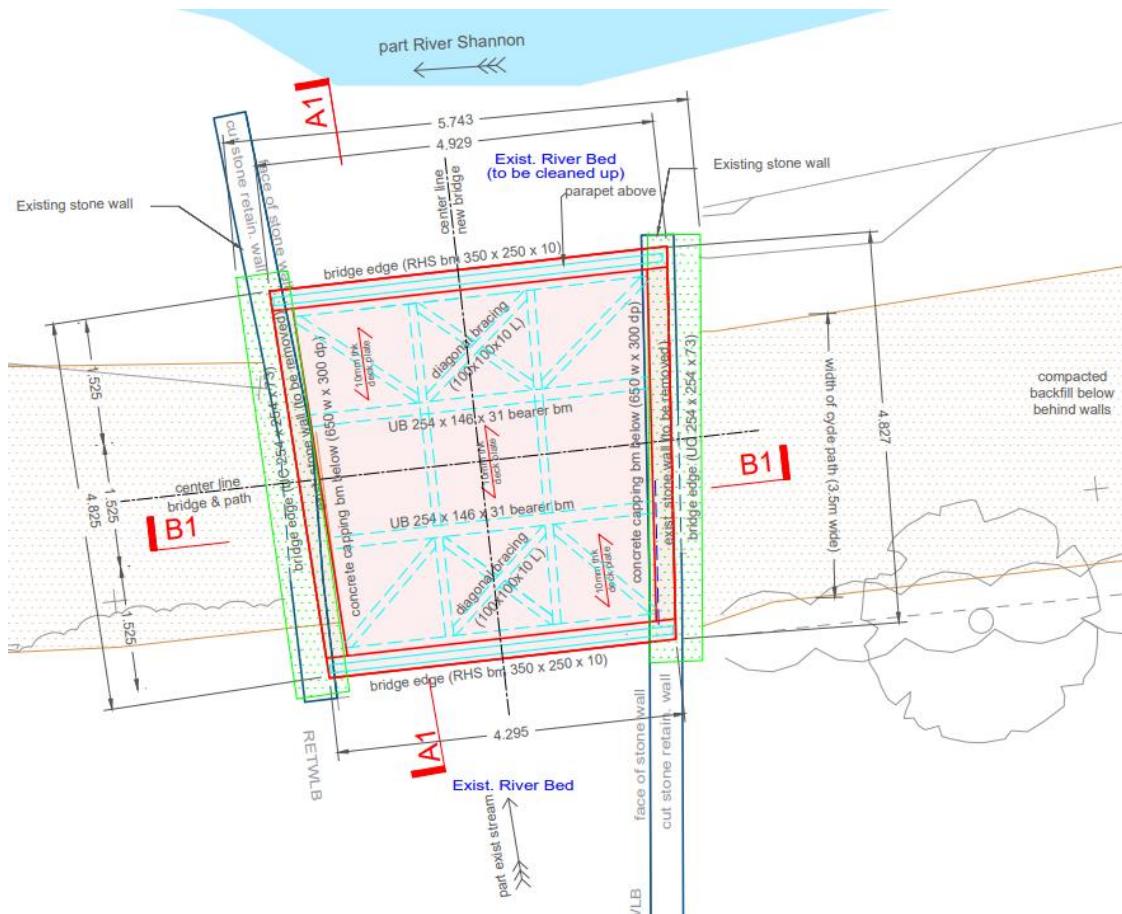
Proposed plan of Bridge 4 deck replacement
